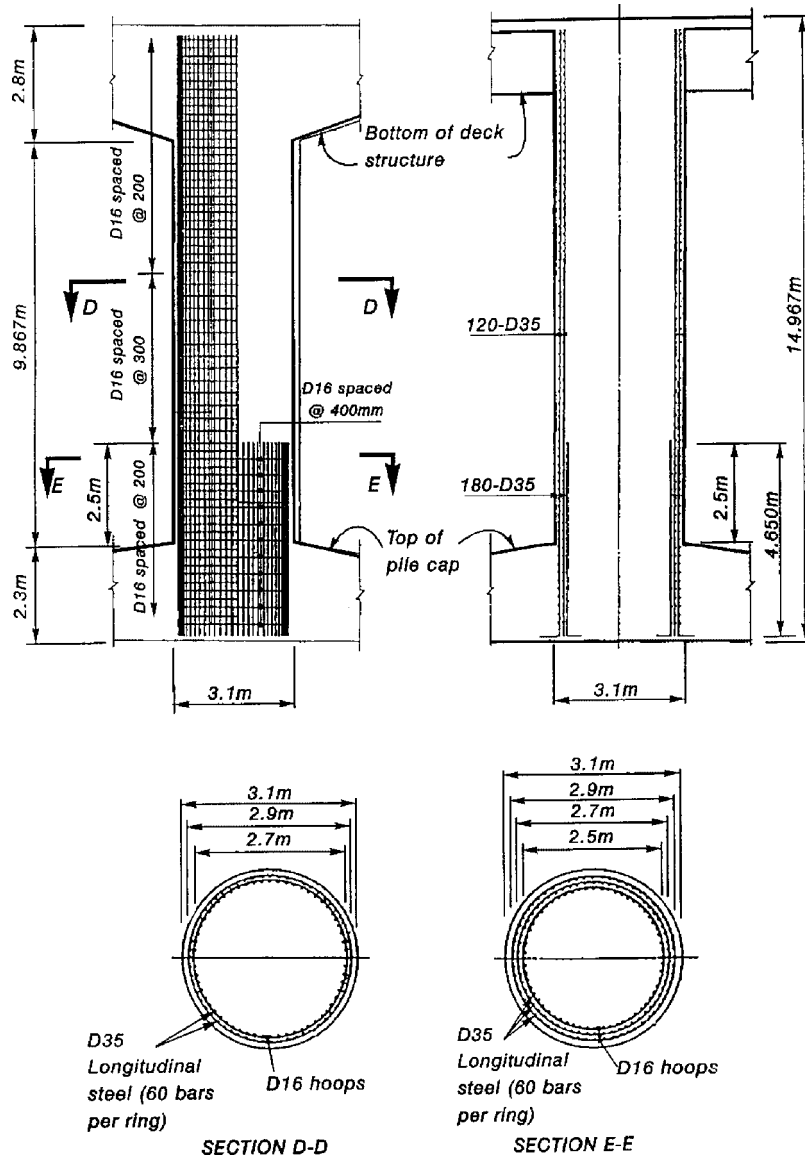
Pier reinforcement and structural details (after Iwasaki *et al.* [7]).
